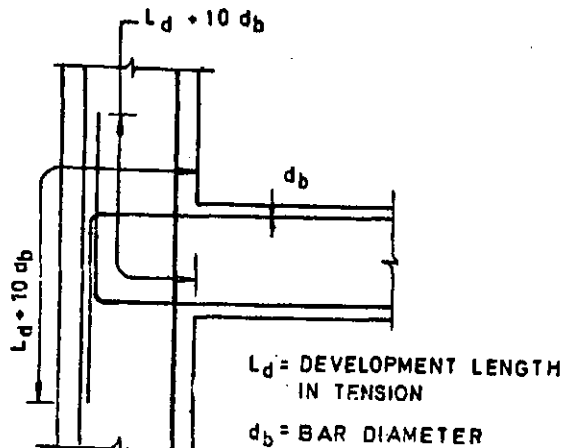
ANCHORAGE OF BEAM BARS IN AN EXTERNAL JOINT
